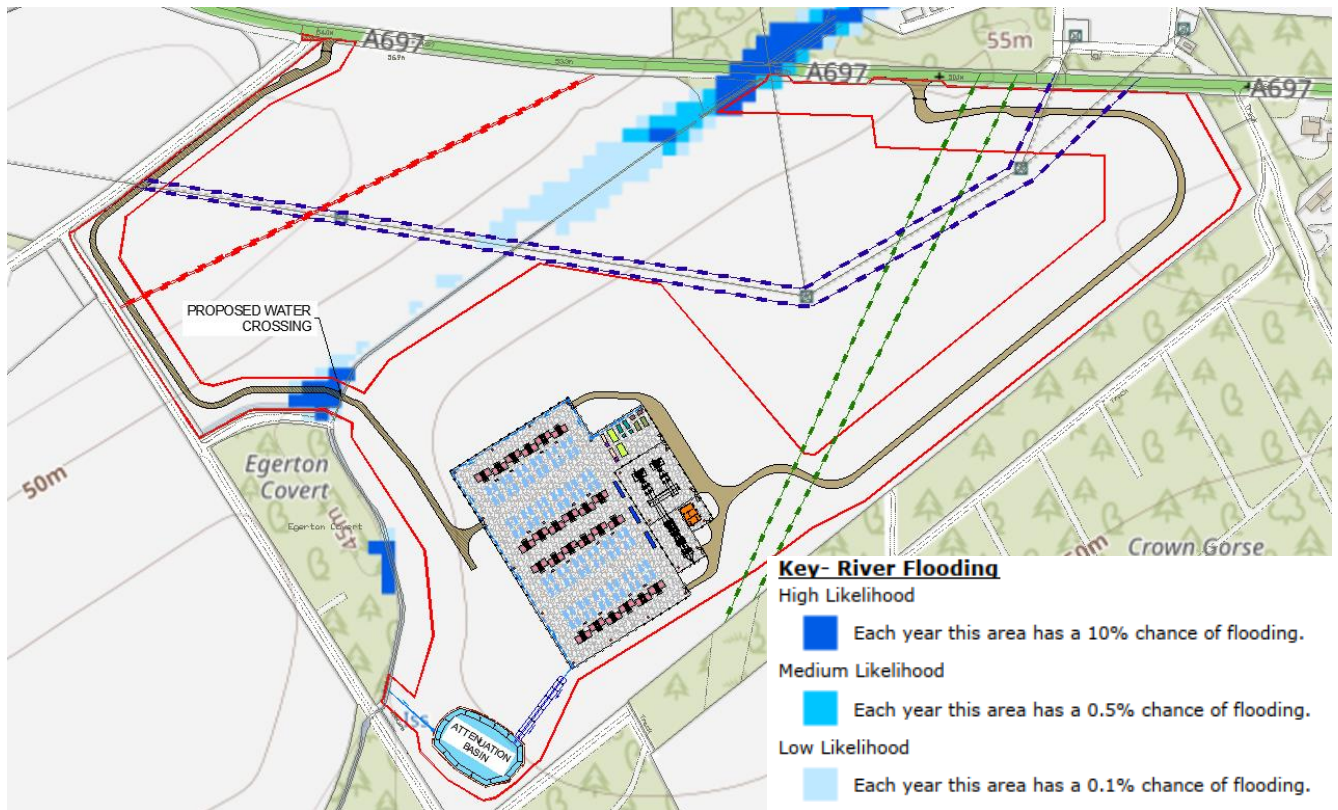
Excerpt from SEPA fluvial flood risk map, with proposed development and site boundary overlaid.
